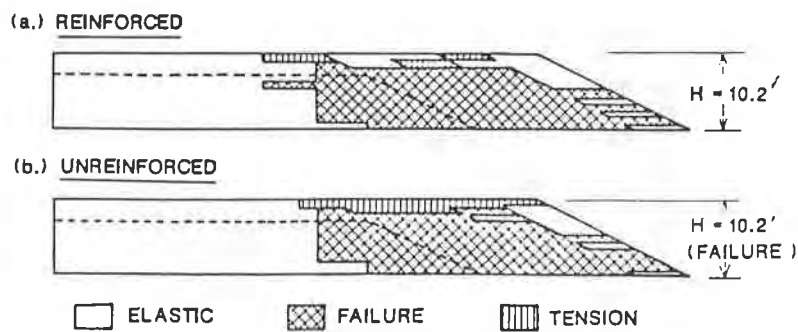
State in embankment for reinforced and unreinforced embankments, 2.3-m high existing embankment, 9.1-m widened section, weak crust (10.2' = 3.1 m).
